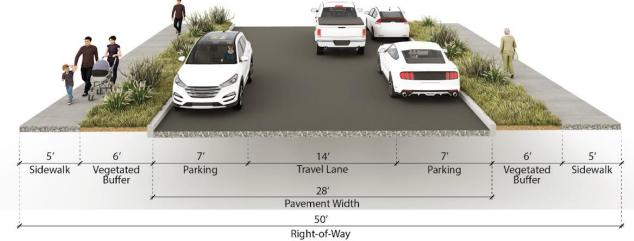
Cross-section for Urban Local Street – Standard Residential Street
